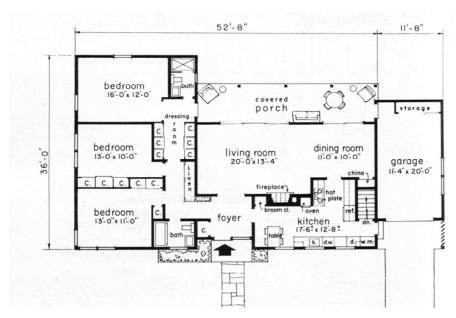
Asymmetrical plan. Note the lack of walls between living and dining rooms.
